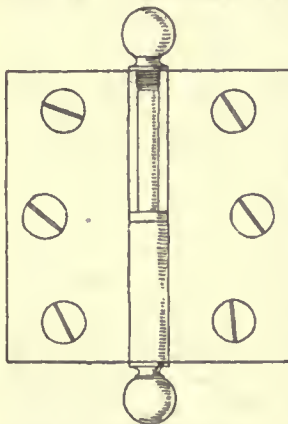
Improved Loose-joint Butt. Yale & Towne Manufg. Co.
